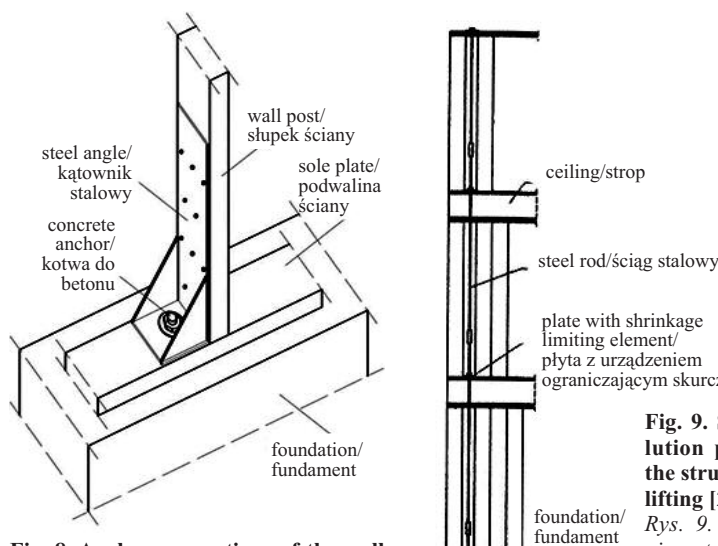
Anchor connections of the wall panel post to the foundation [21]
